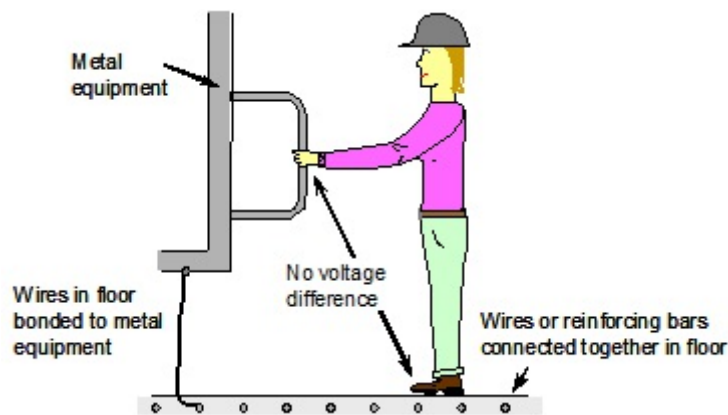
Reinforcing metal installed in a concrete floor and bonded to exposed metal above will result in an equipotential bonding grid where there is little or no difference in voltage between the floor and the exposed equipment.
